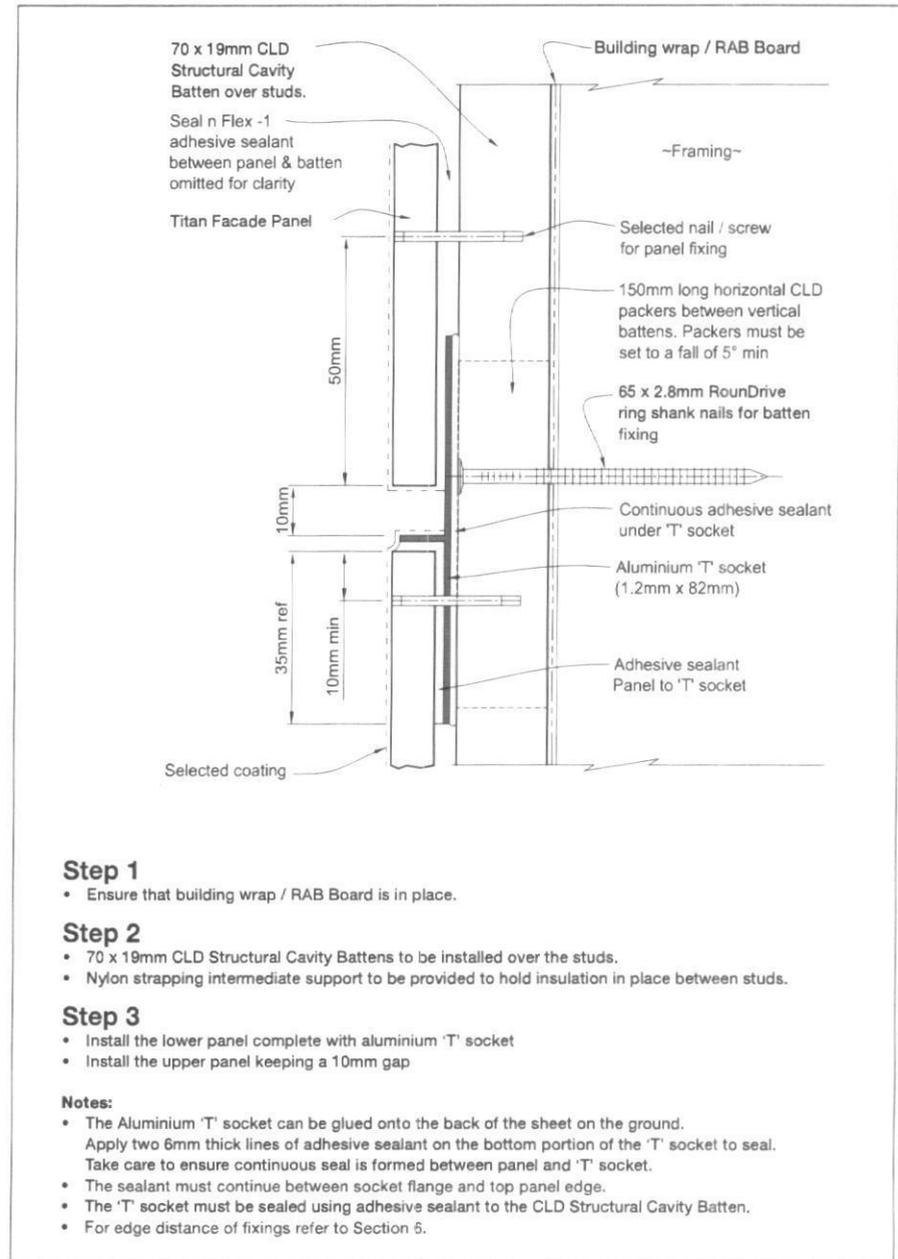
MID FLOOR ALUMINIUM SOCKET JOINT
